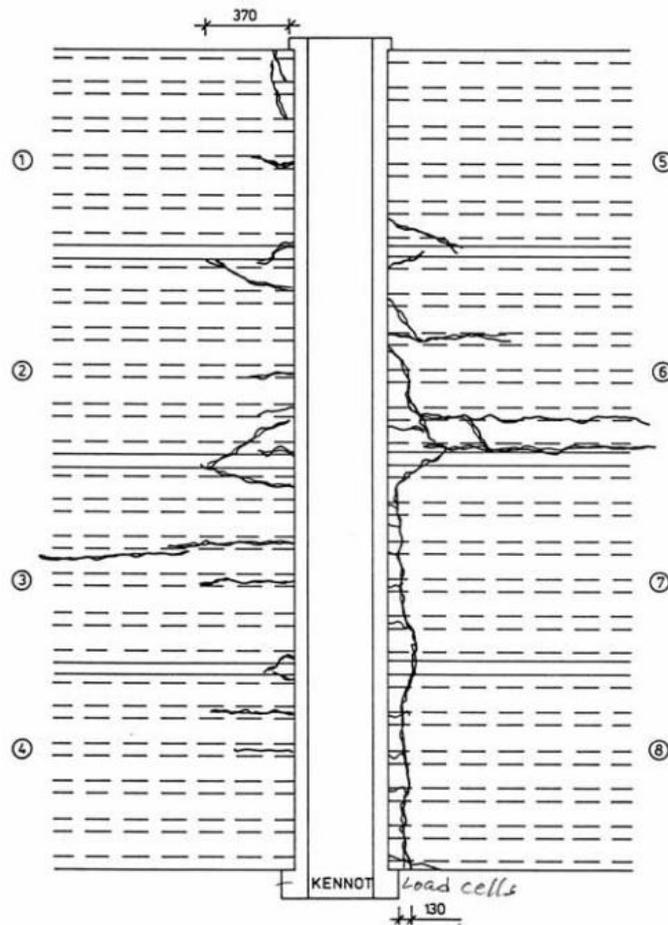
Failure scheme (Finnish shear tests on floors in 1990–2006)
